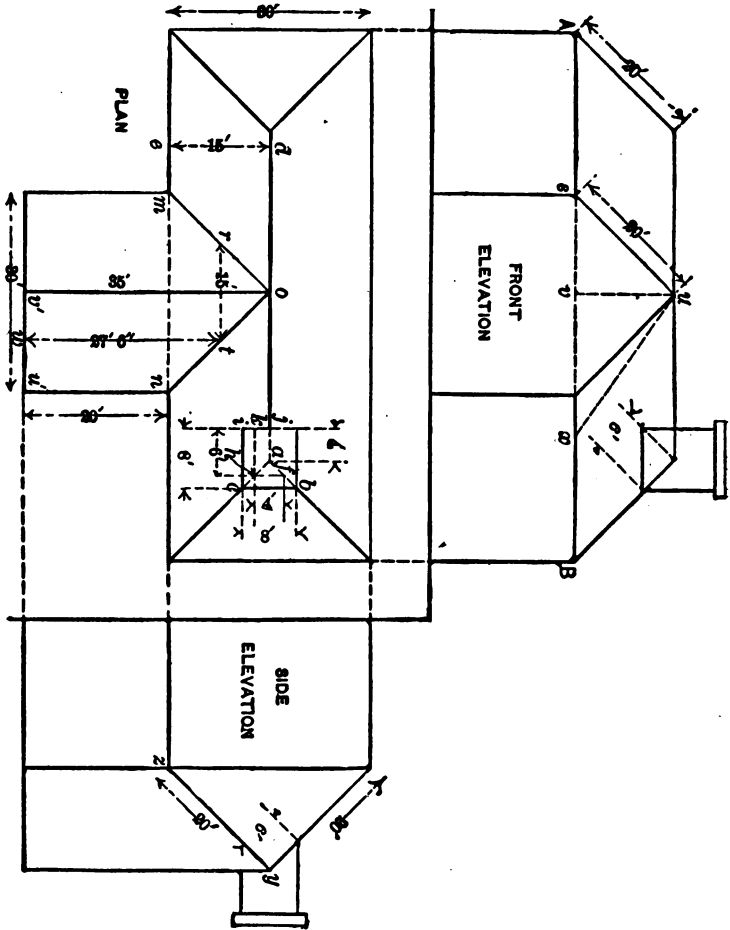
Plan and Elevations of Hip Roof with Wing Attached
